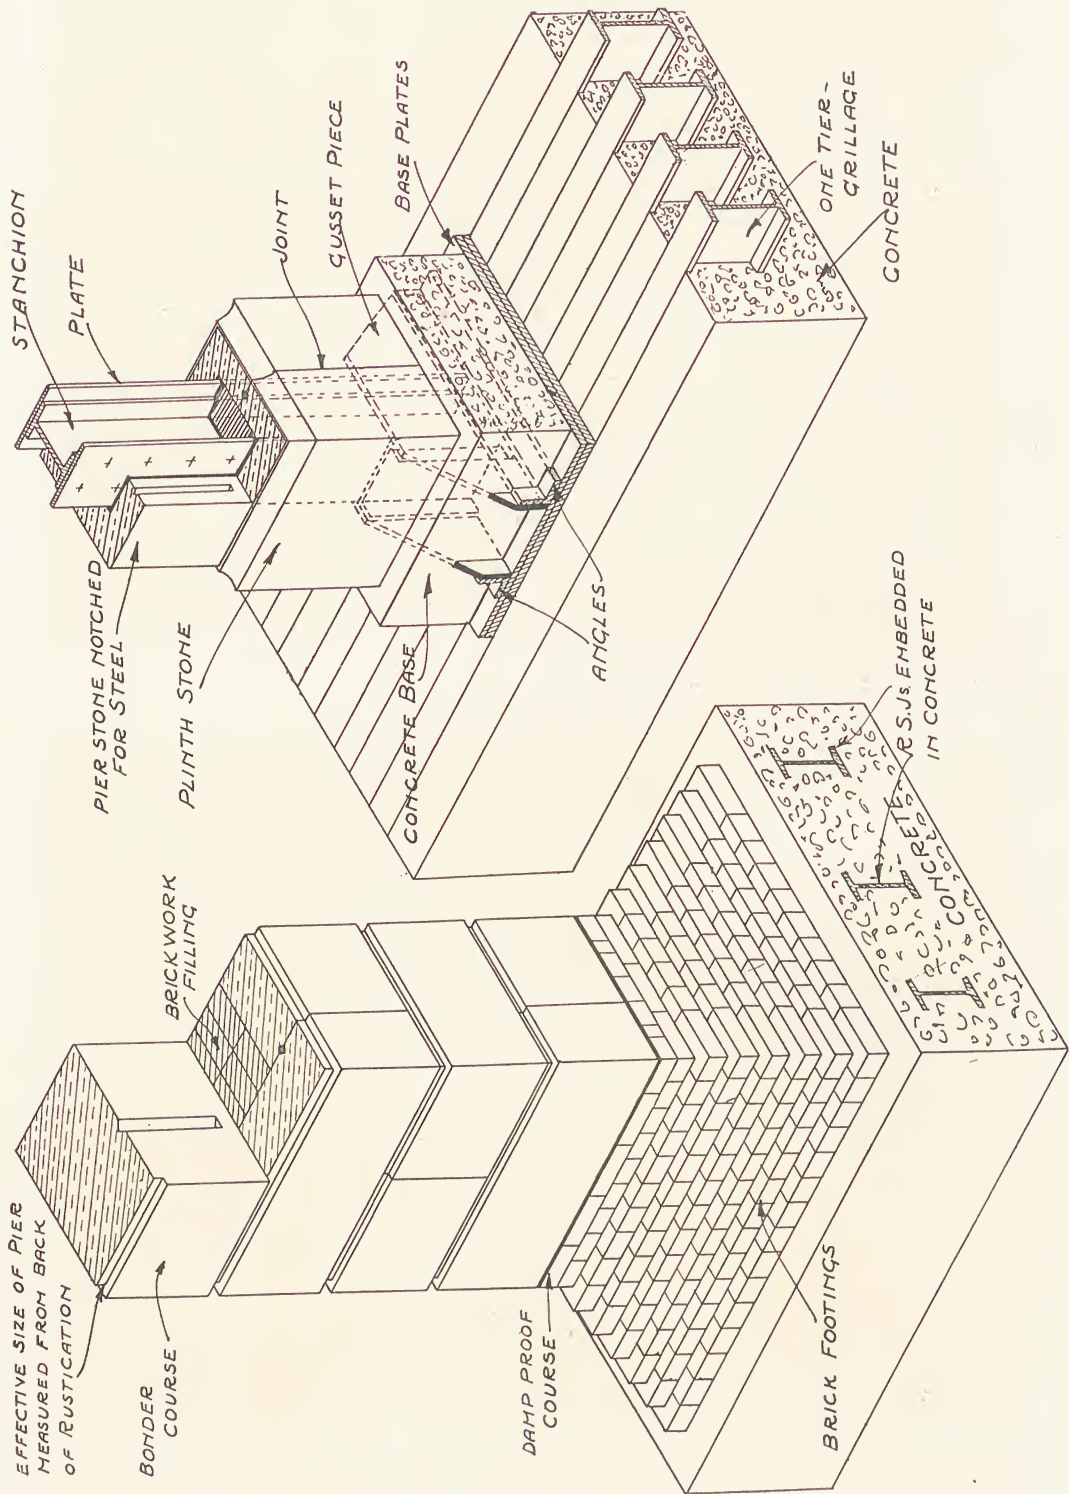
CONSTRUCTION AT QUOIN OF BUILDING.
